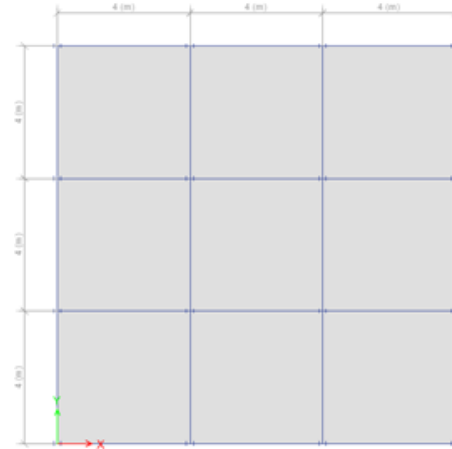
TYPICAL PLAN COMMON TO ALL 11 STOREY DIAGRID BUILDING
